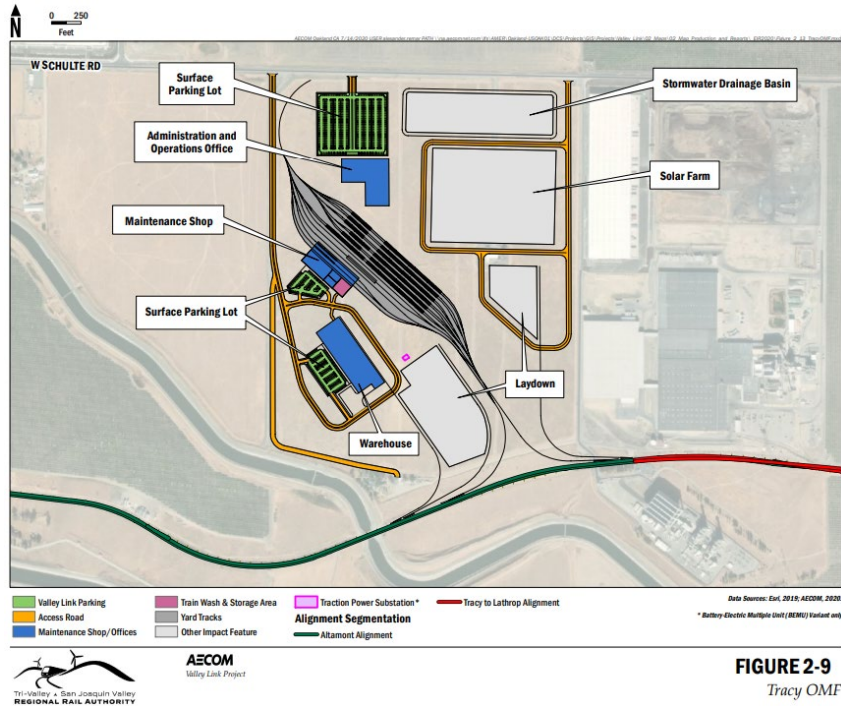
Proposed Valley Link Tracy OMF Site Plan.
